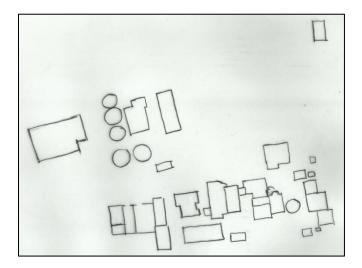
Clusters of buildings and structures defining the form and layout of the Mooifontein farmstead.
